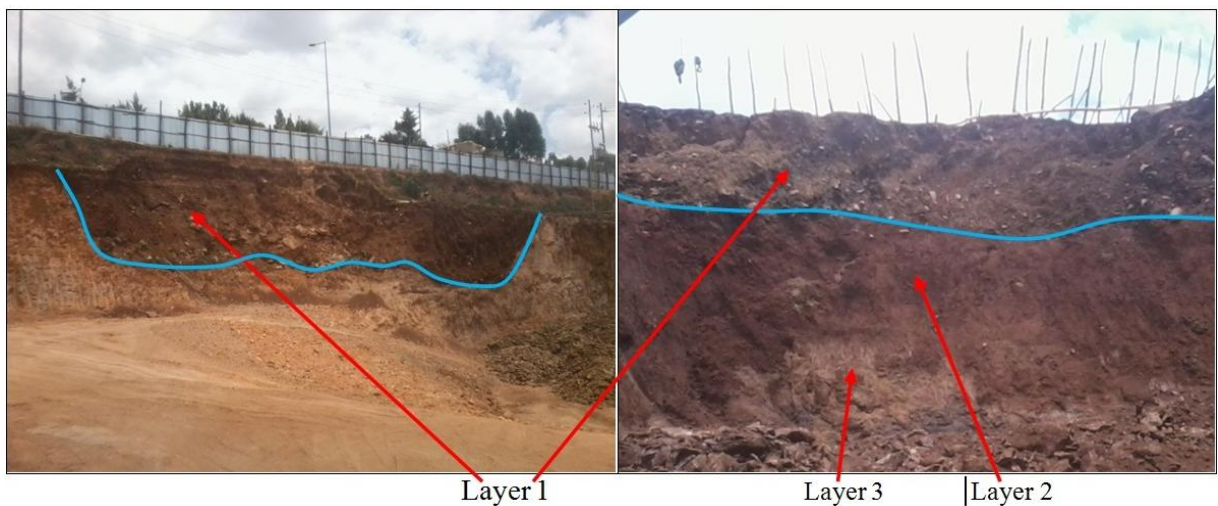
excavation outcrop showing different soil stratigraphy of Asco site (Block-9 and 6)
